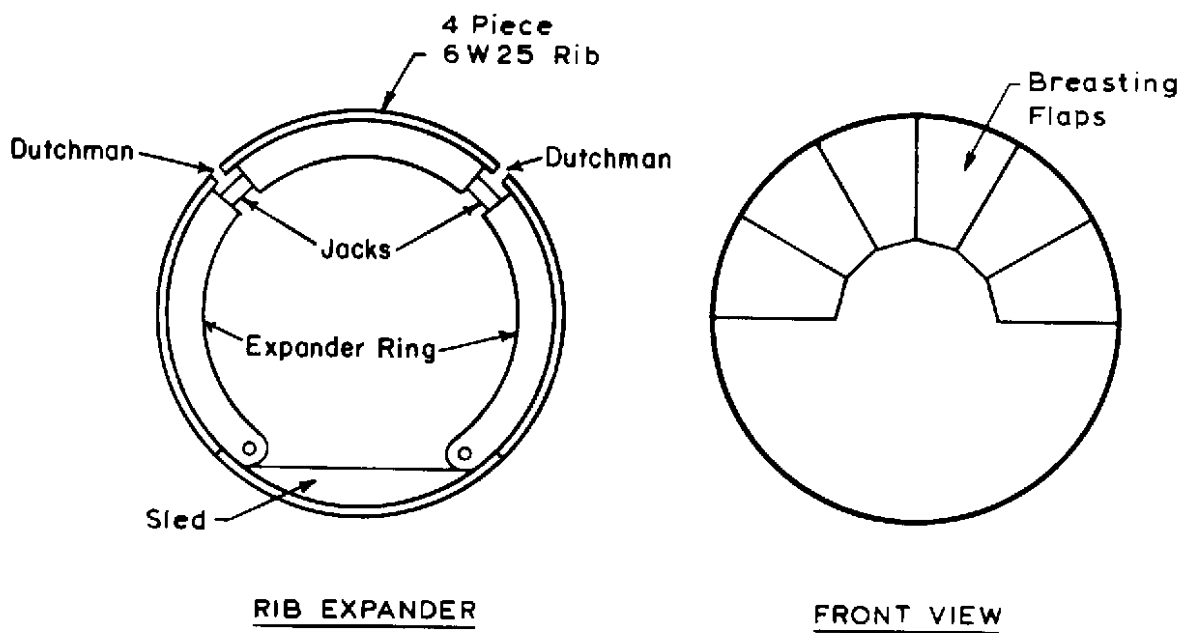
SECTION G1 TUNNEL SHIELD DIMENSIONS
